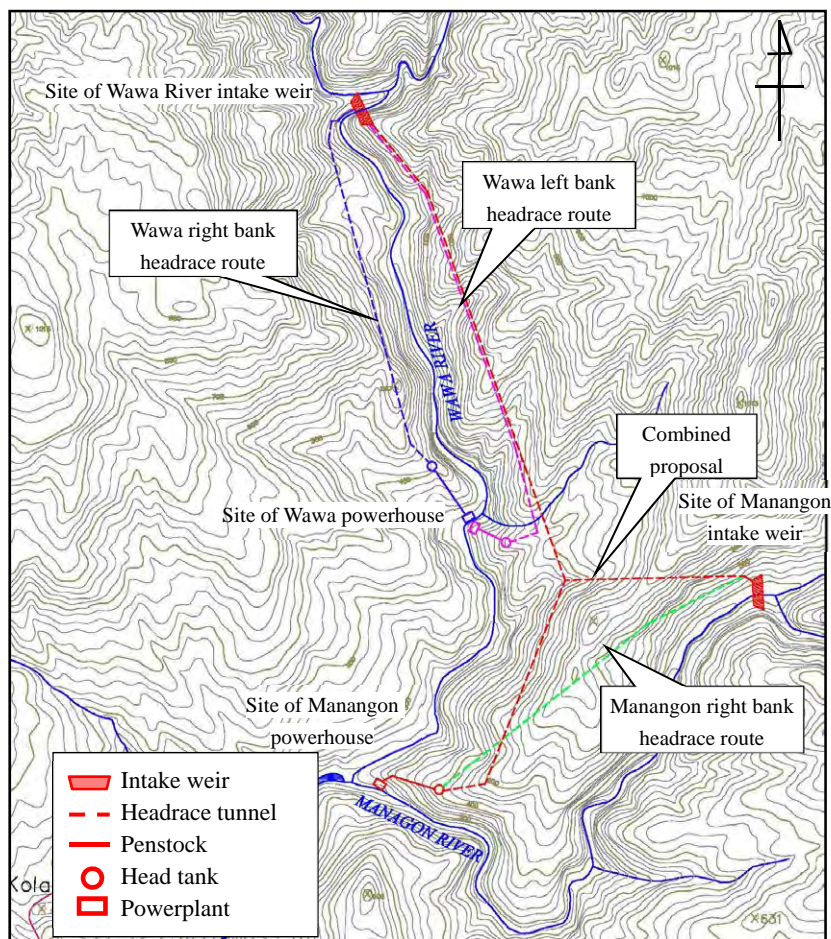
Proposed layout for Wawa No. 2 power plant
